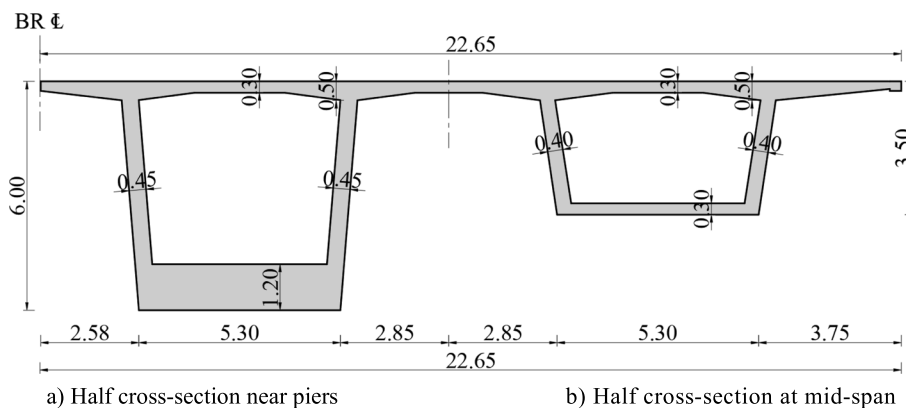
Typical cross-sections of El-Warrak Bridge. a Half cross-section near piers. b Half cross-section at mid-span
